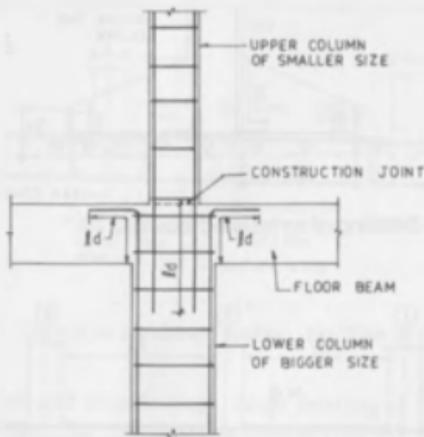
Detail of column bars when lower column is bigger and the upper column is small.
